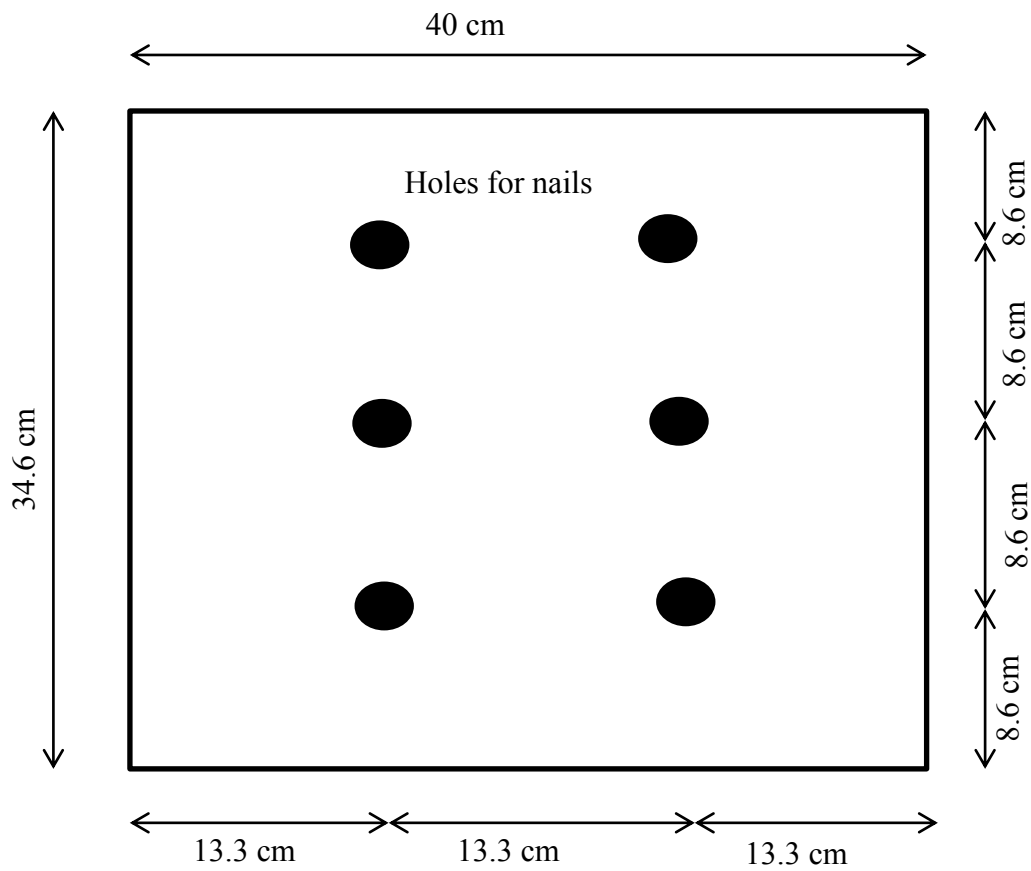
(b) Cross-section of facing of wooden ply.
